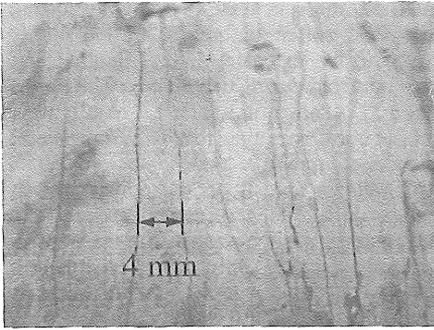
Vertical, lateral cracking in ECC compression specimen.
